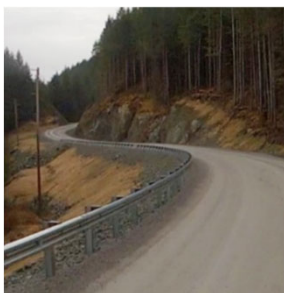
Guardrail installed in front of a steep slope on Kasaan Road.
